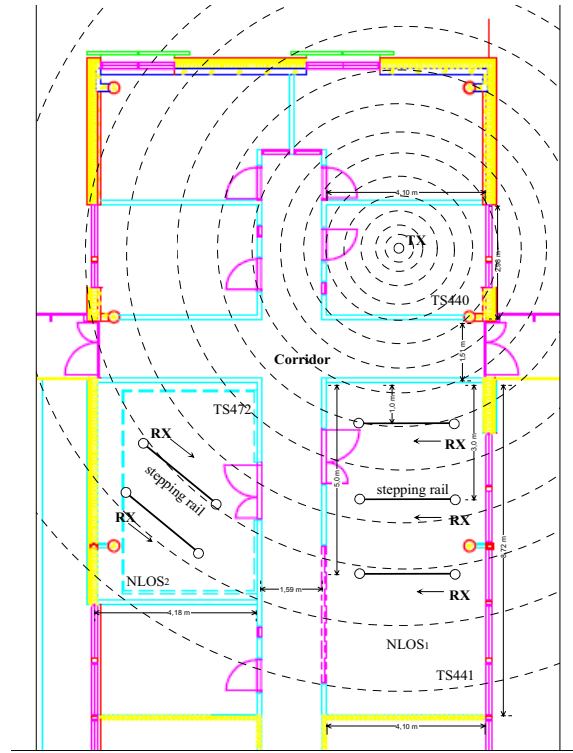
Floor plan of the office building where the channel measurements were carried out.
